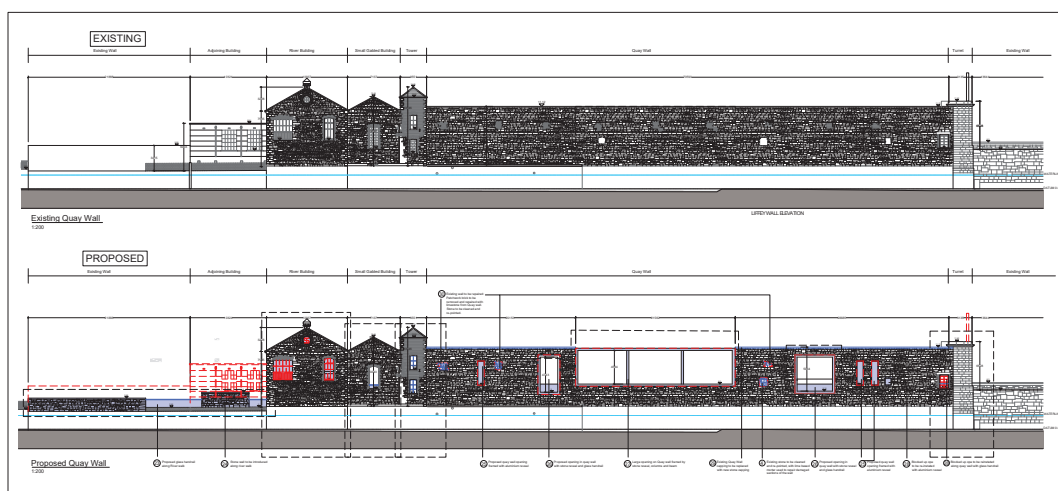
Architects drawing showing the proposed works to Riverside Stone Wall
